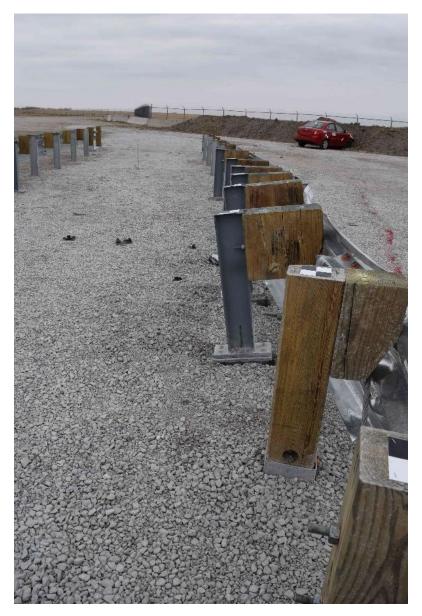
Blockout Damage, Test No. MSPBN-2 100
